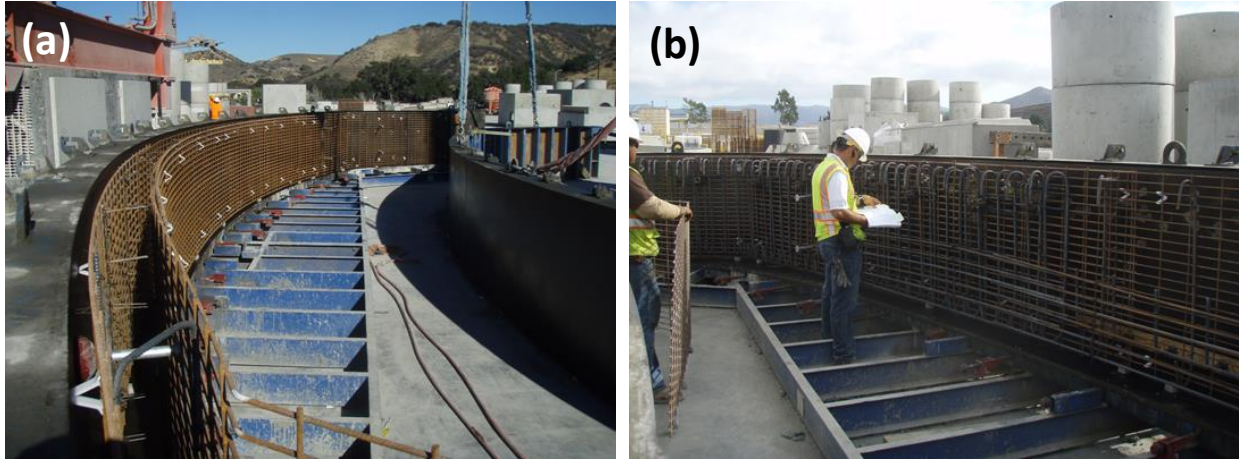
Pre-Con bridge fabrication of one of the arches (a) prior to closing the form and (b) during rebar inspection.
